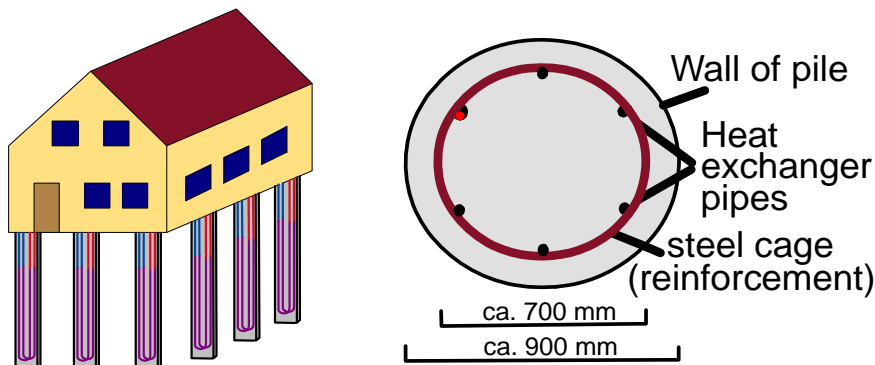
Energy piles and cross-section of a pile with 3 loops
